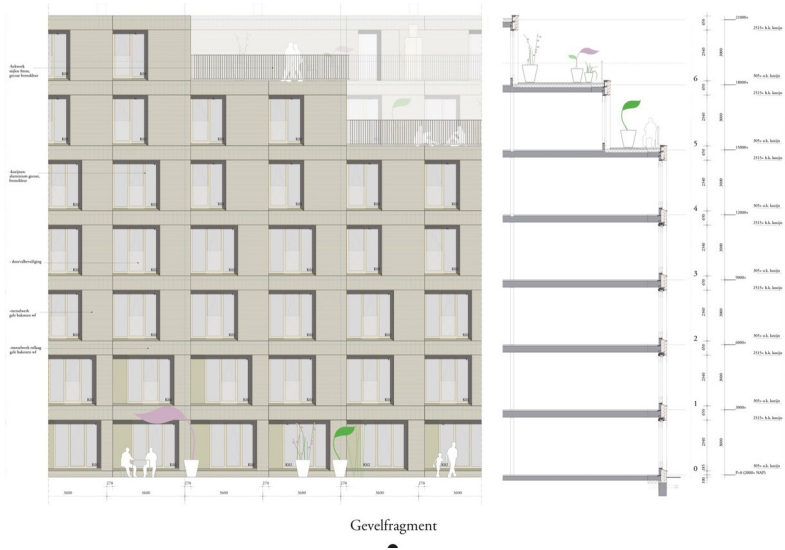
Facade section [Studionedots, n.d.]
